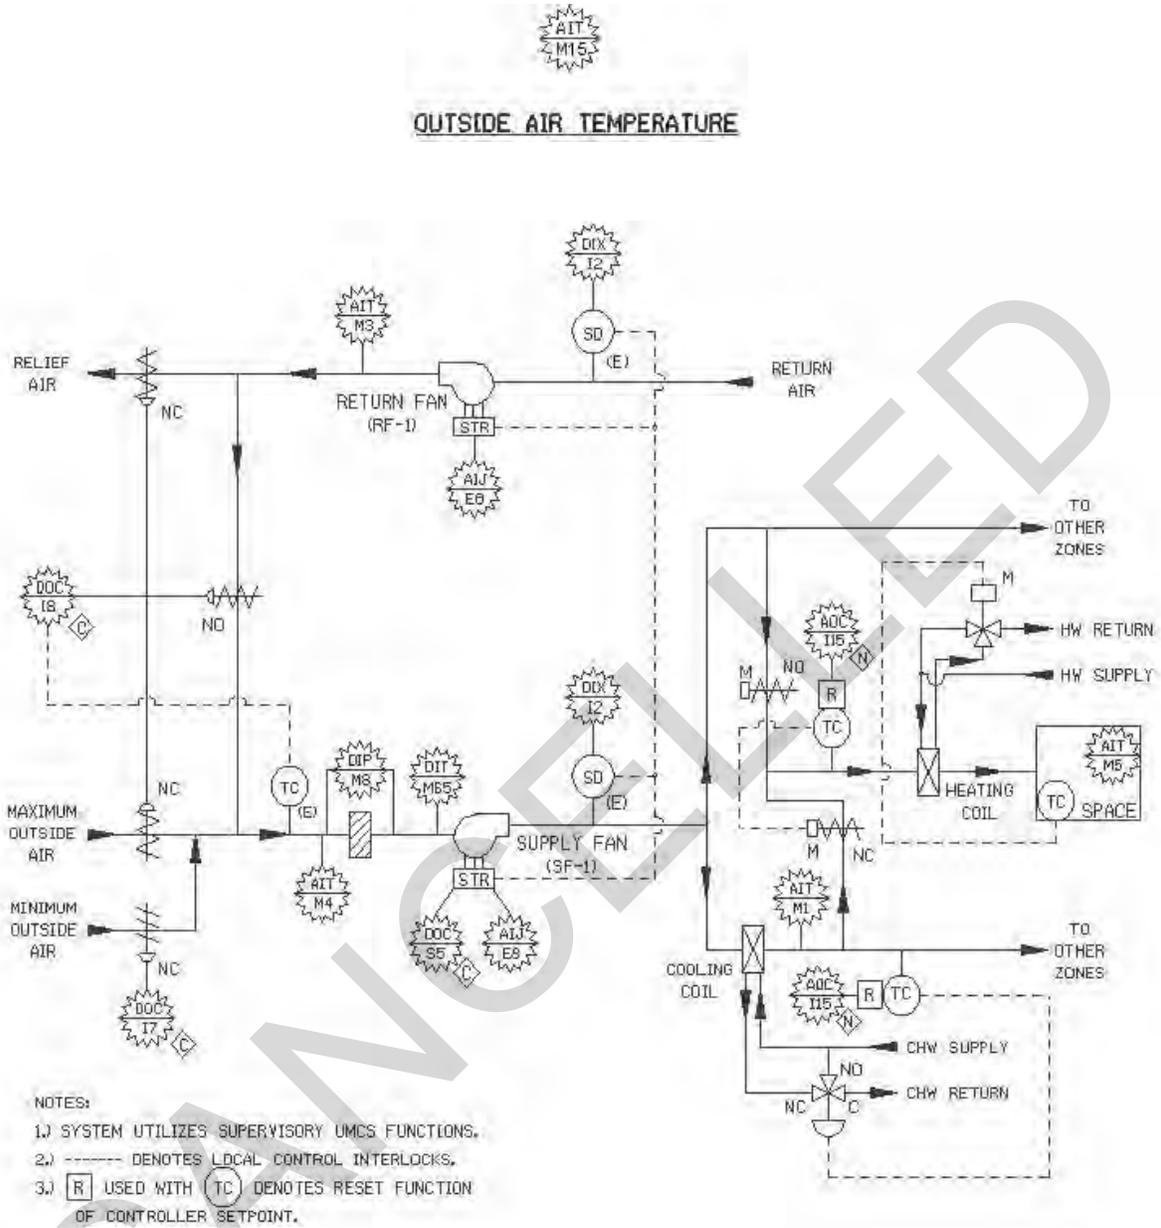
Bypass Multi-Zone Air Handling System with Hot Water and Chilled Water Coils.
